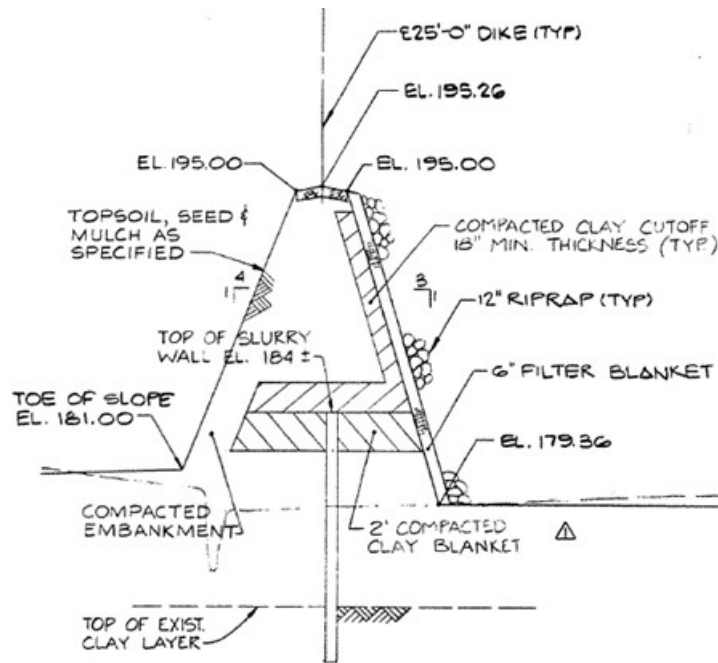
Cross-Section View of Surface Impoundment Embankment with Slurry Wall (B&M 1981)
